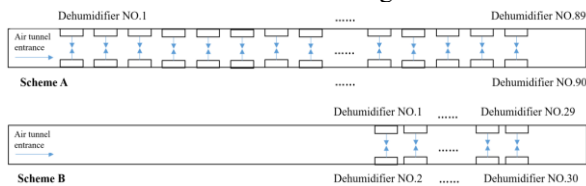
Ventilation tunnel dehumidifier layout scheme
